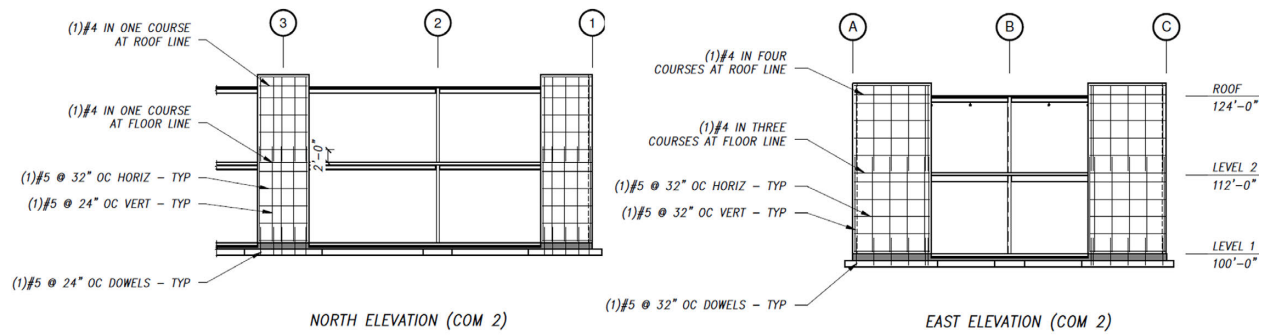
Reinforcing details of the RM shear walls of the commercial building archetype (courtesy of Dr. G. Kingsley).
